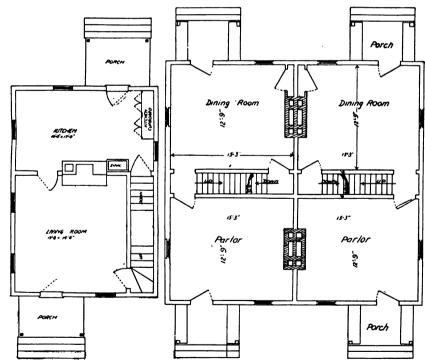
FIRST-FLOOR PLANS OF ONE-FAMILY HOUSE.
